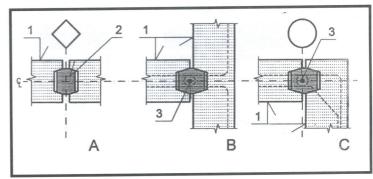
Load Bearing Wall-Loading Bearing Wall
